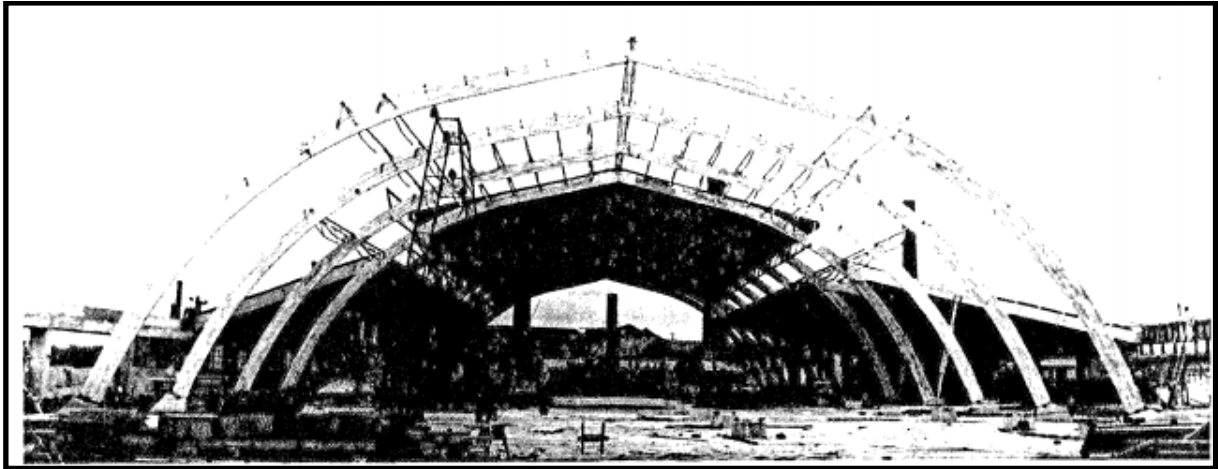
Arches under construction at Symonds St Peters Factory (Holland Street section), c1946. (Source: Nolan, 1994)
